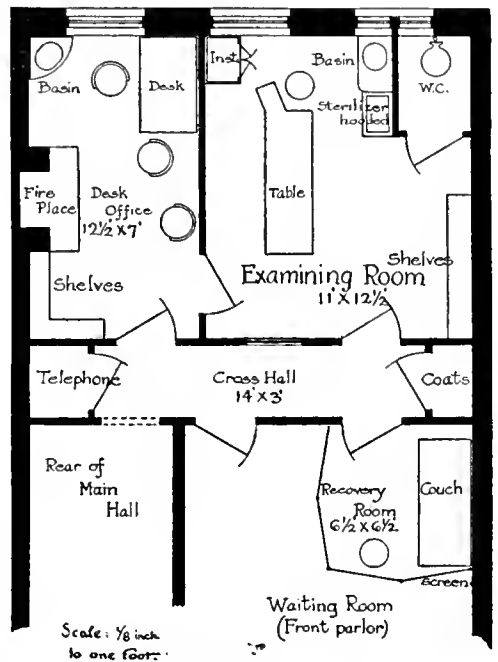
20-ft. house, without extension, altered for offices. Alternate plan to Fig. 1. Cross hall better lighted, but toilet still further from main hall; also, doctor, if called to door of his office, can be seen down the main hall. The plumbing is better grouped. In all the plans the desk office has its own basin, so that after vaginal or other examination, the physician can clean up out of sight of the patient, or can do a minor dressing in either room. In this plan a high window between examining room and cross hall lights the passage, without showing any sign of occupants.
